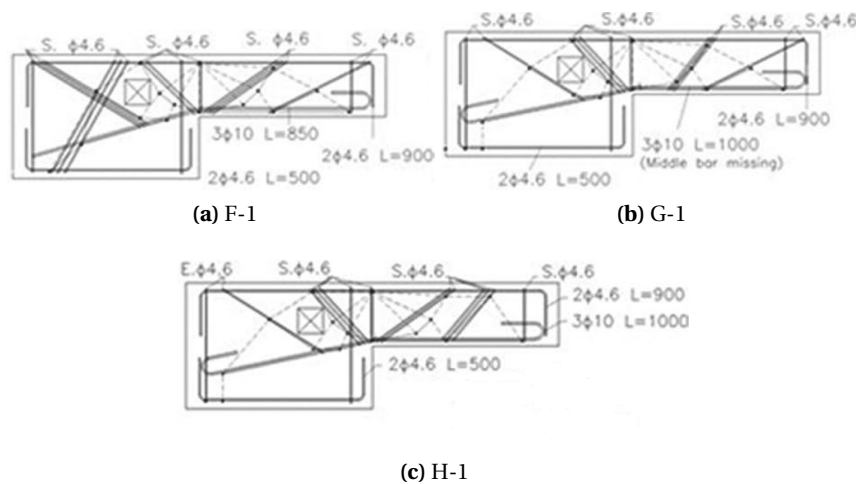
Rebar layouts of specimen F-1, G-1, and H-1 [19].
